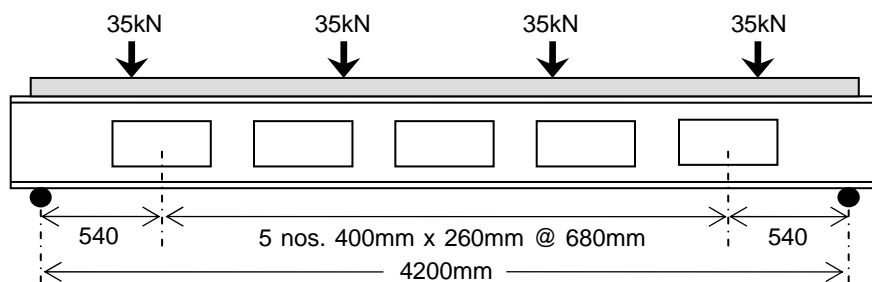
Geometric detail of symmetric composite cellular beam specimen
